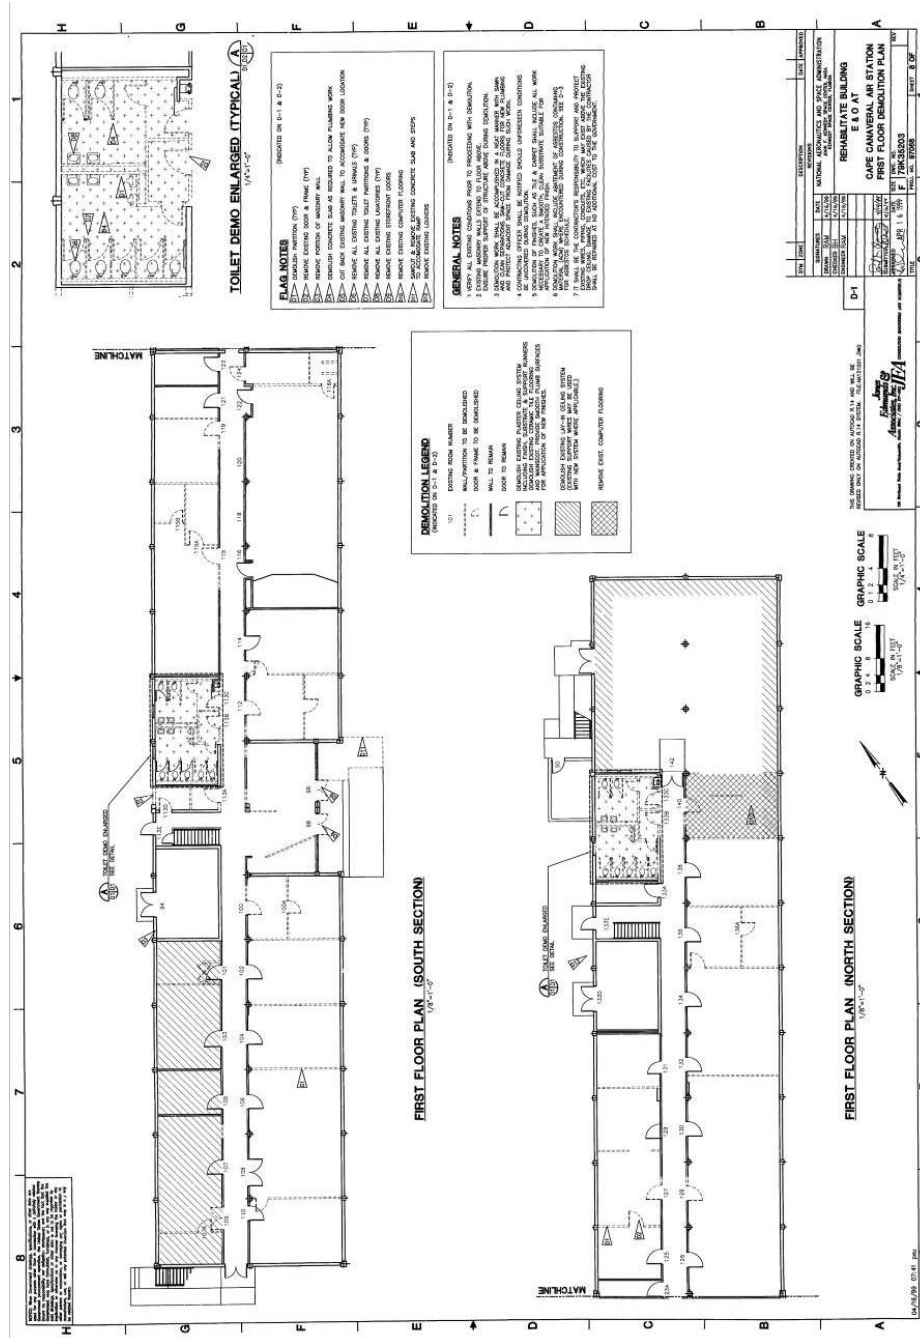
Jones, Edmunds & Assoc., Rehabilitate Building E&O at Cape Canaveral Air Station, First Floor Demolition Plan, April 1999, Sheet 8.
